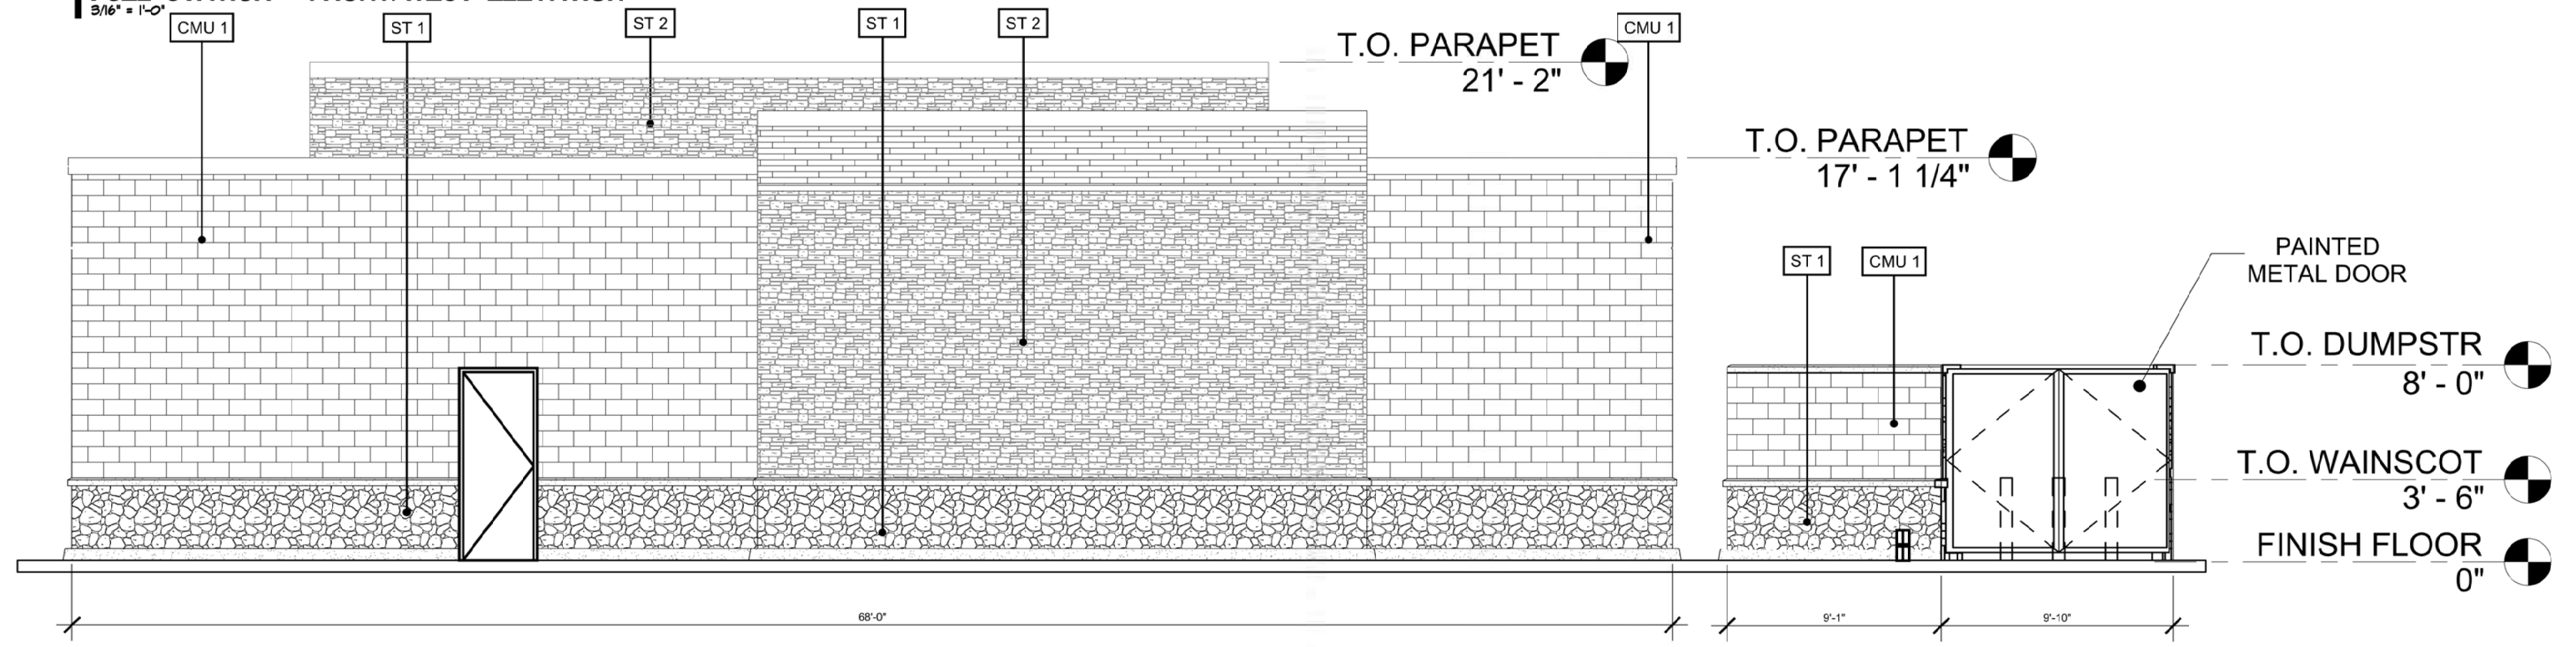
EXTERIOR ELEVATIONS - RETAIL D
